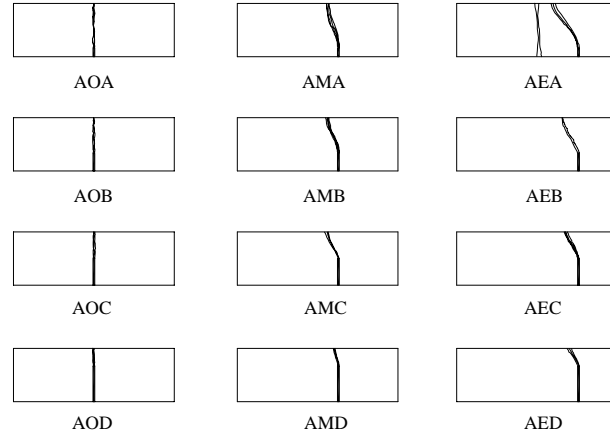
Cracking Path of Specimens (Brick A, Granville Gray)
